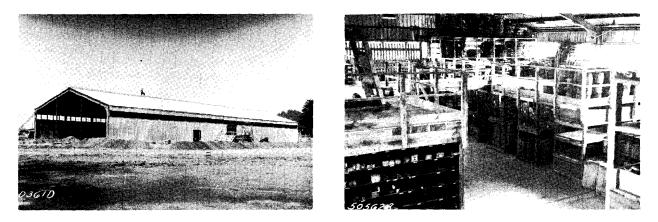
The main warehouse building, of structural steel construction, was divided one-fifth for office space, one-fifth for construction material, and the remaining space for permanent material. Erection of steel and wooden bins allowed maximum utilization of available space.
